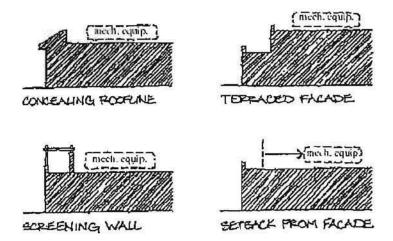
G – Rooftop equipment shall be screened from street level view through on the methods shown.
